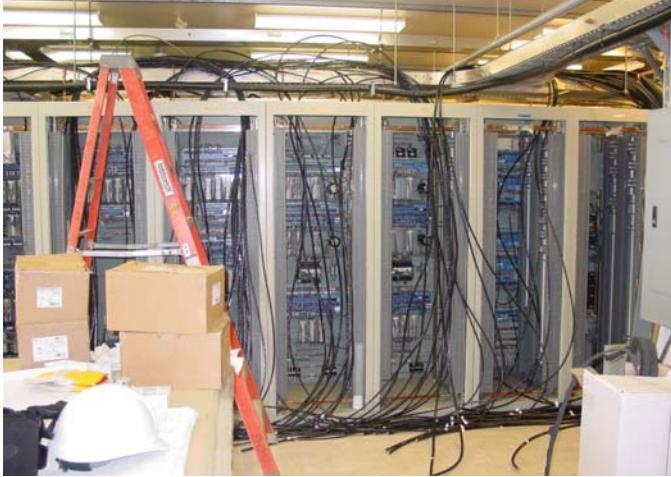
Portage la Prairie South Protection and Control Panels During Installation
